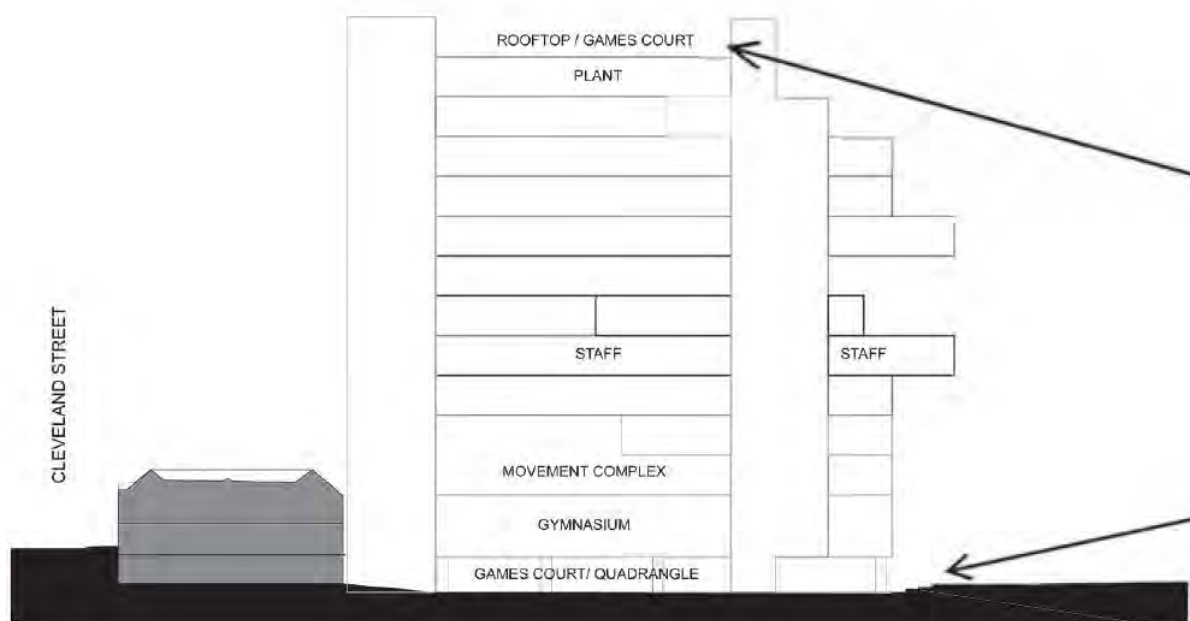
Detail of Concept Plan 1, Section drawing of the new building. Perumal Pedavoli 2015: 29.
